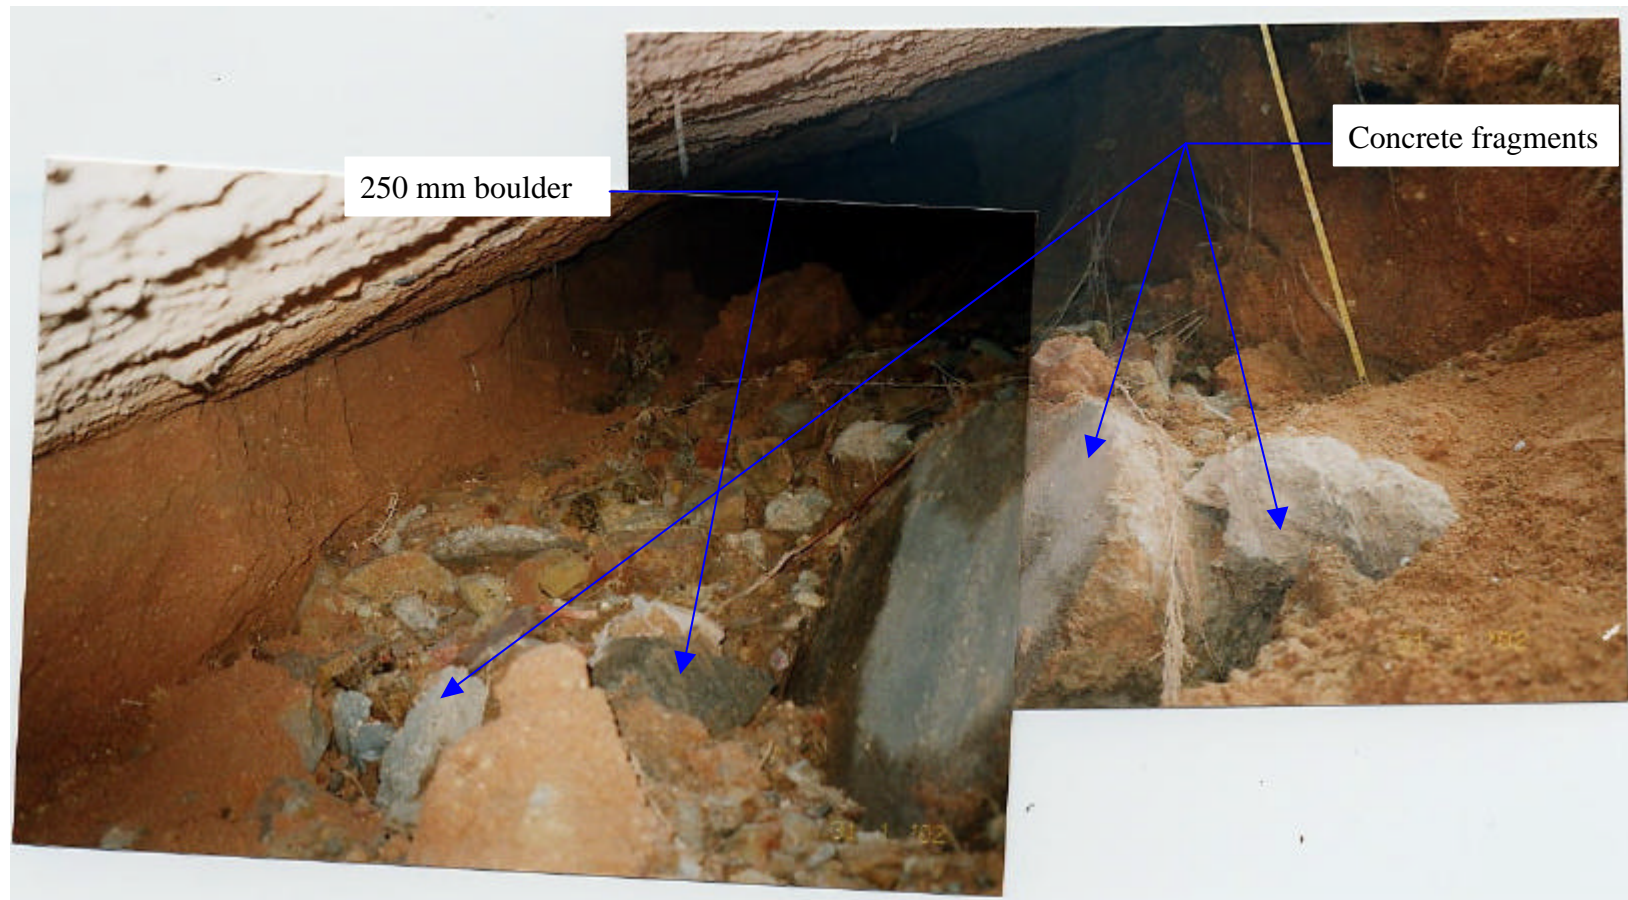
Concrete Fragments and Boulders Exposed within the Erosion Gully
